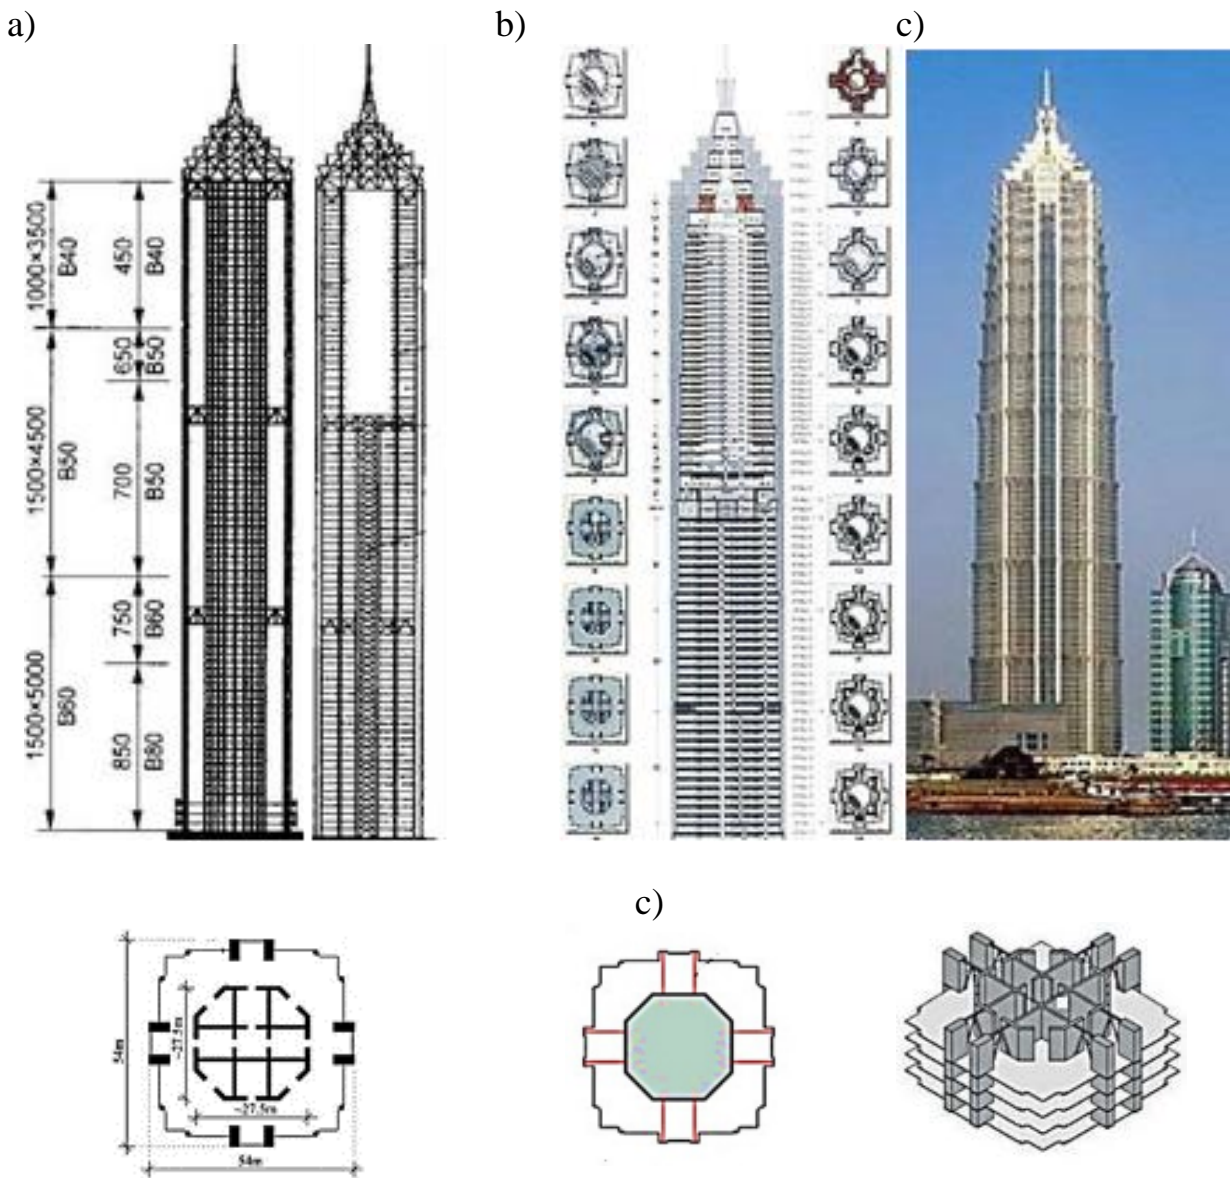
Jin Mao Tower: a – constructive solution;
